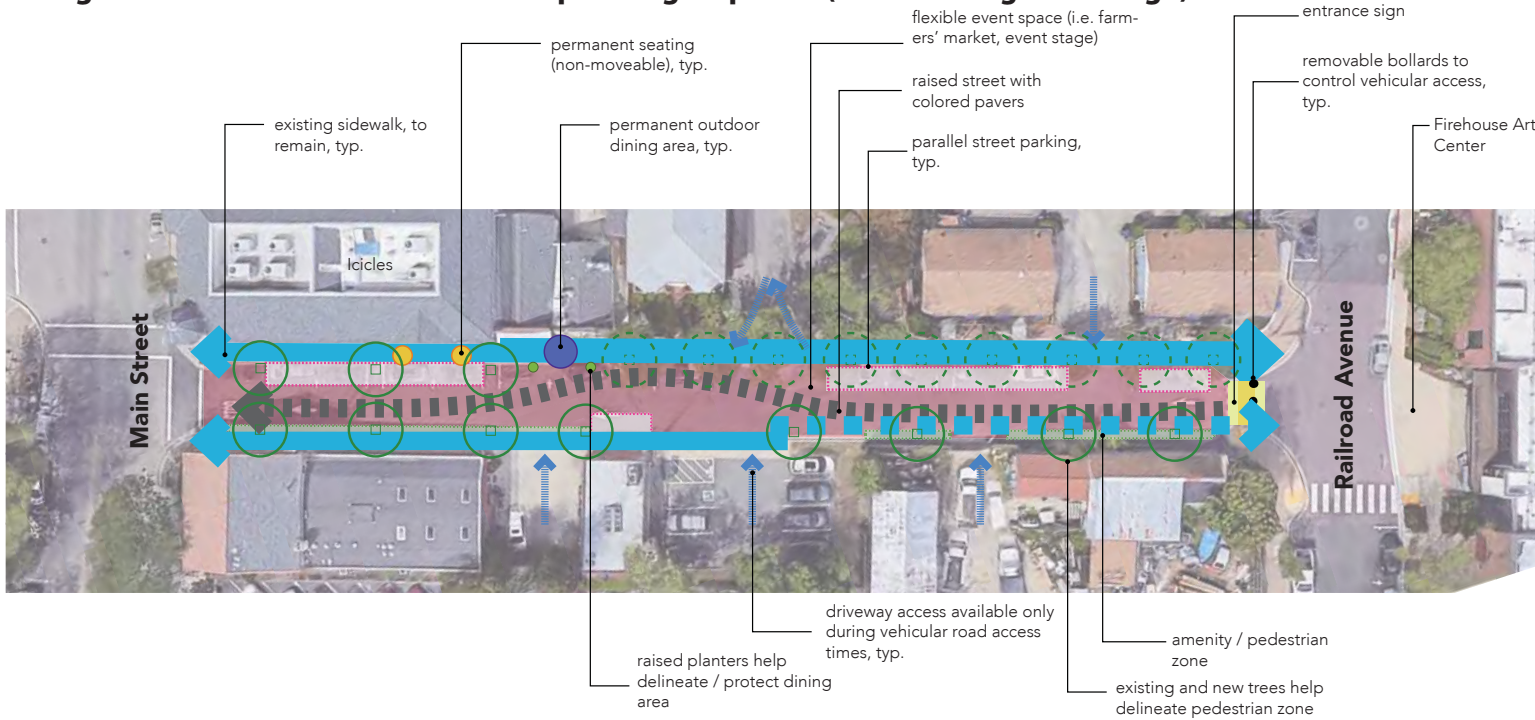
Division Street Streetscape Design Options (Medium Degree Change)
